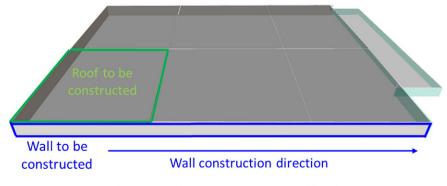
4D BIM with on-going construction tasks highlighted.
